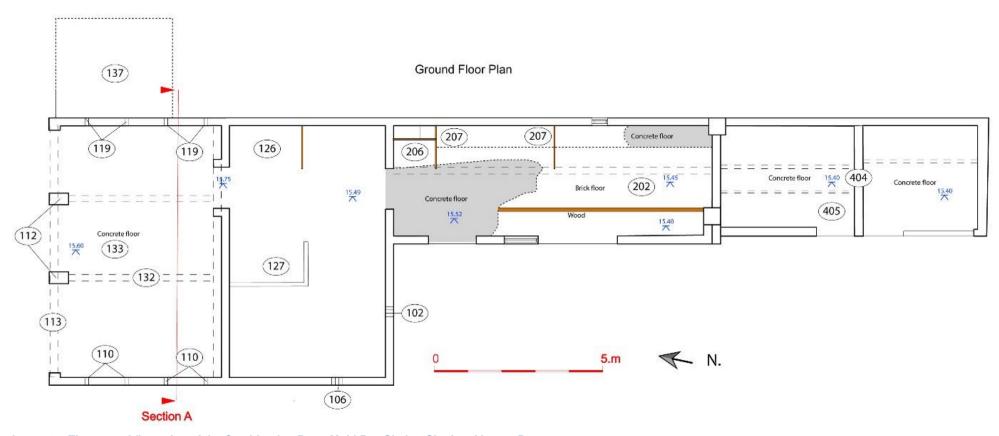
The ground floor plan of the Combination Barn, Multi Bay Shelter Shed and Loose Box.
